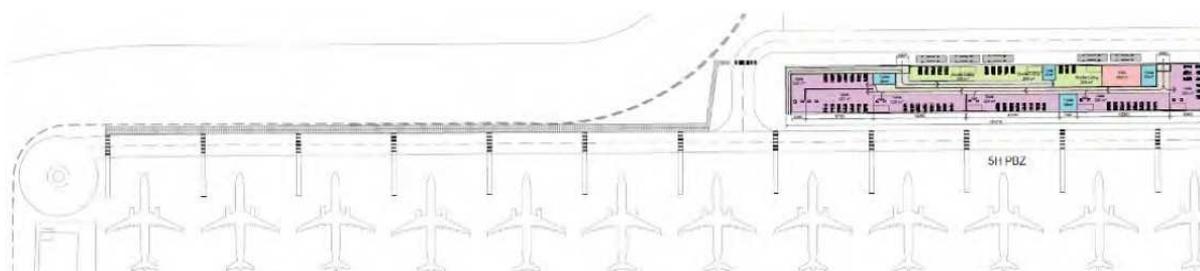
Plan view of PBZ ground floor and protected walkway along apron 5H
